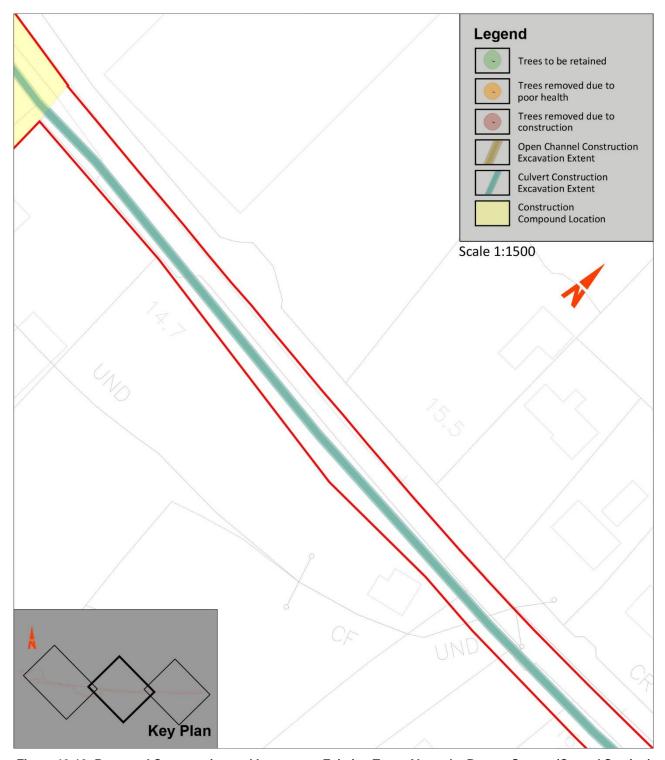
Proposed Construction and Impacts on Existing Trees Along the Bunree Stream (Central Section)
